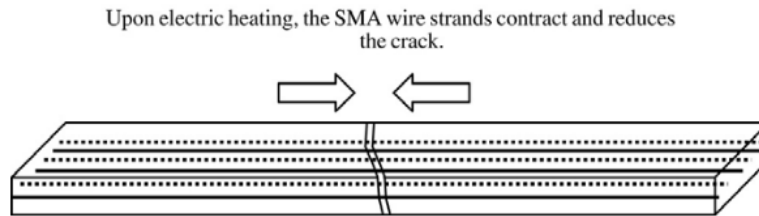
Schematic of intelligent reinforced concrete specimen
